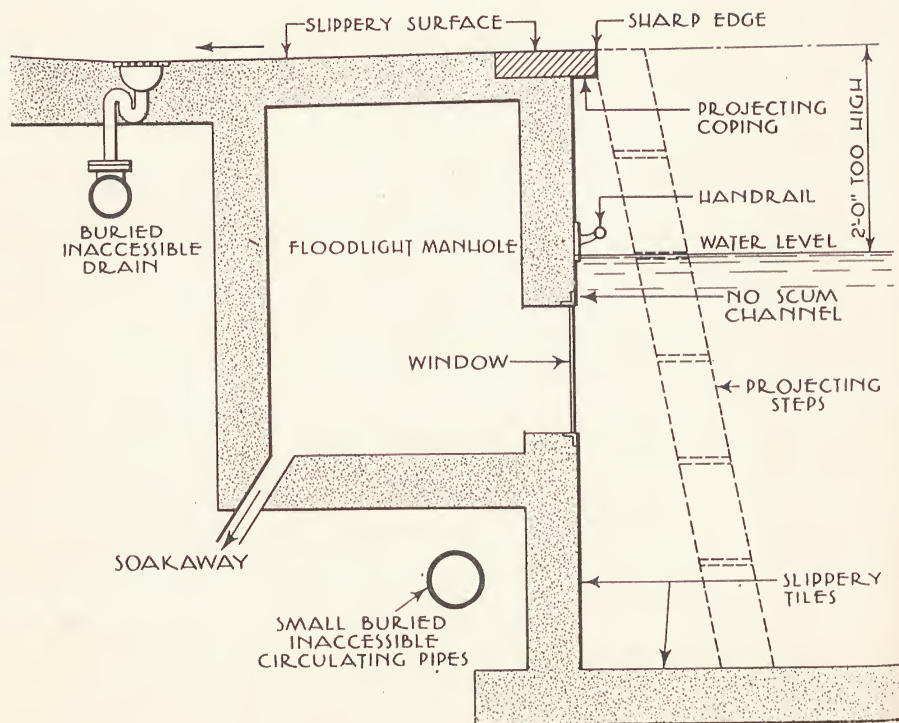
INCORRECT DETAILS FOR BATH WALL
